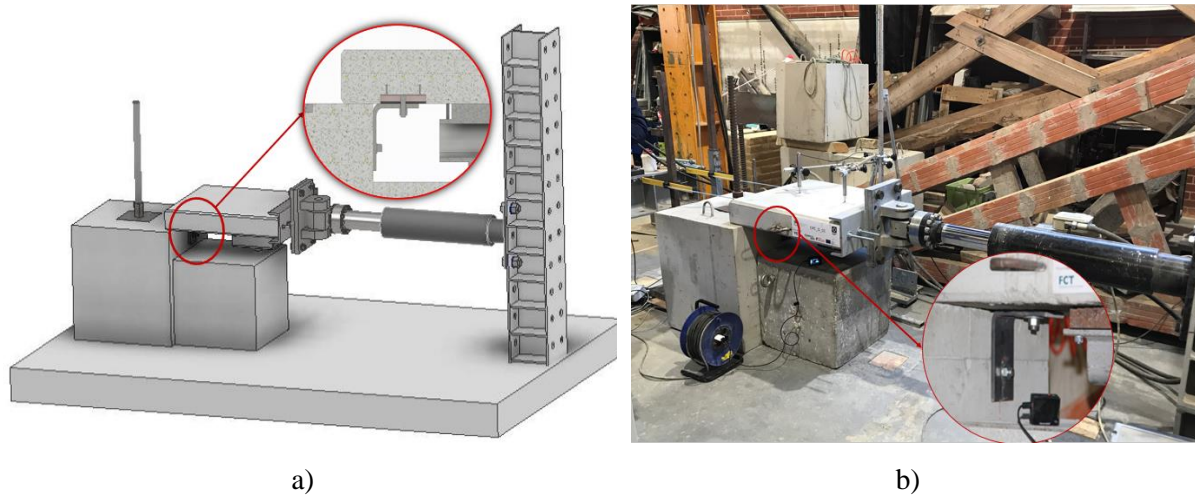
Schematic testing of the cladding-to-column connection in-plane: a) Test scheme; b) General view.
